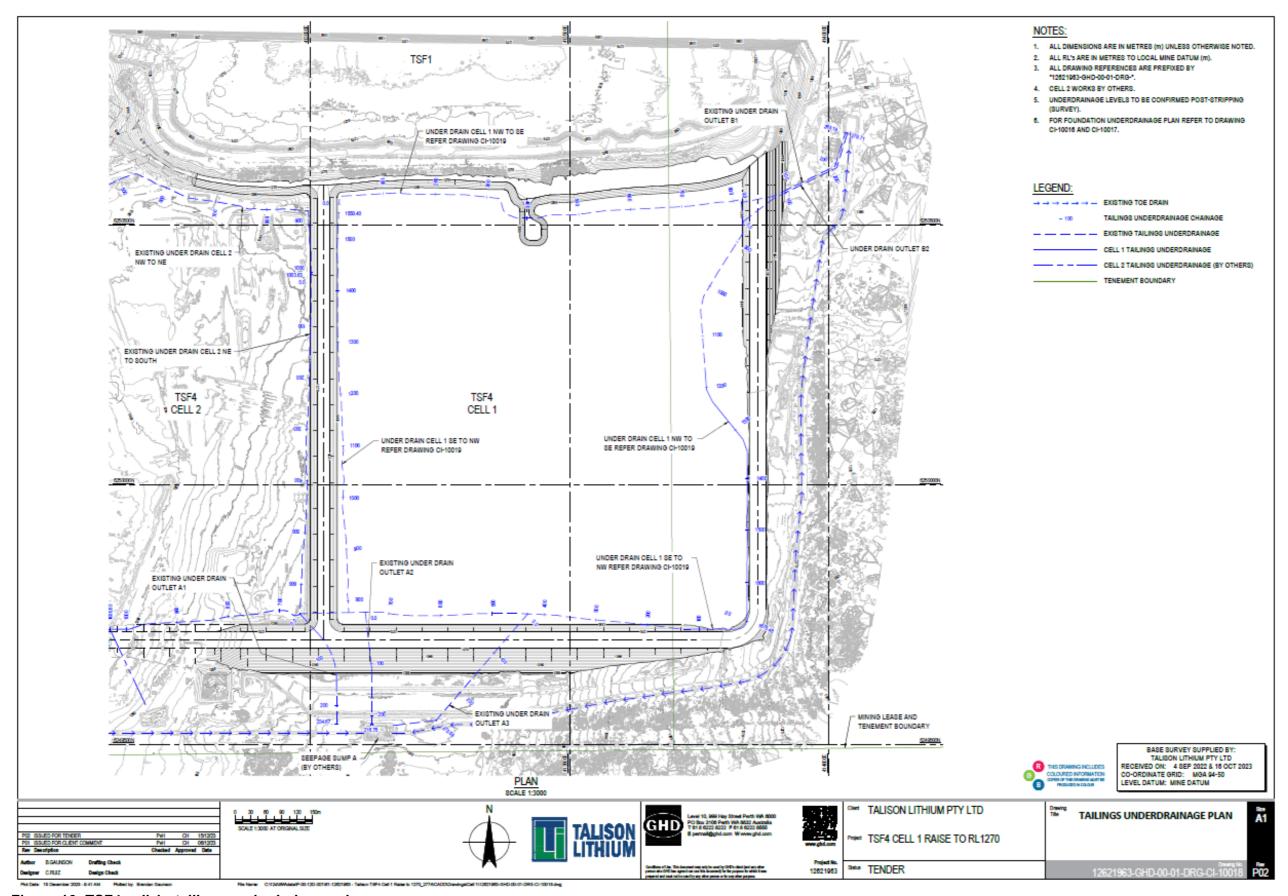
TSF4 cell 1 - tailings underdrainage plan
